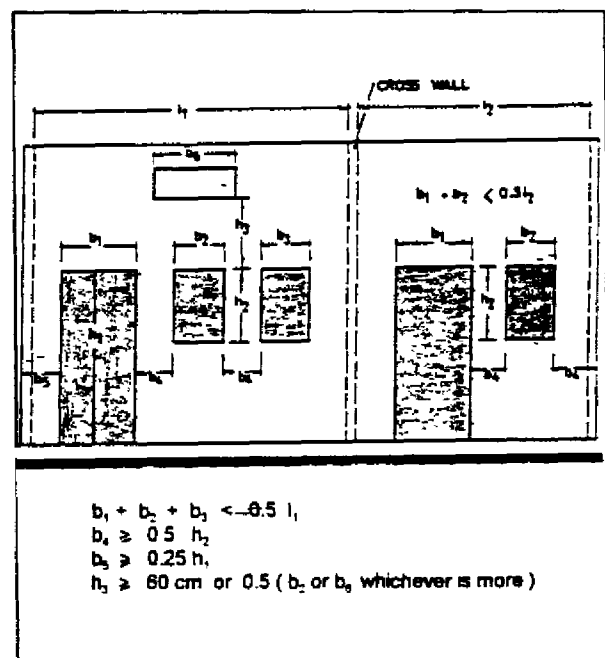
Recommendation Regarding Openings in Bearing Walls [1]
